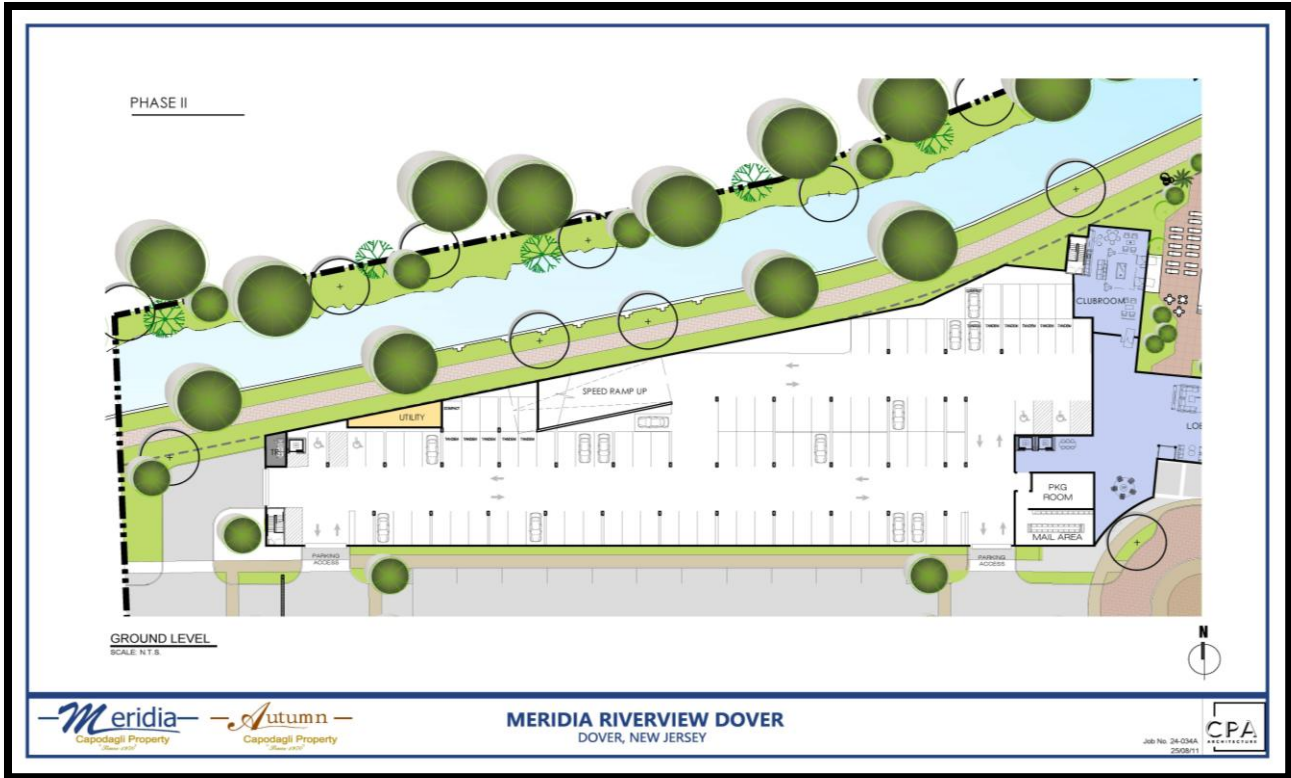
Conceptual Site Plan Building Phase 2: At Grade Parking Level Typ.
